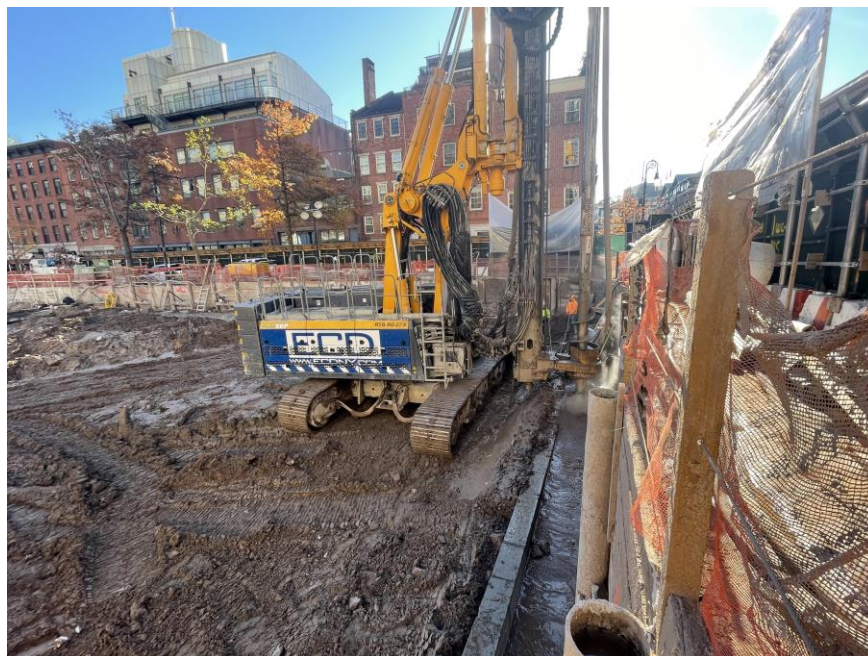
ECD installing a soil mix column in the southwest part of site (facing south).
